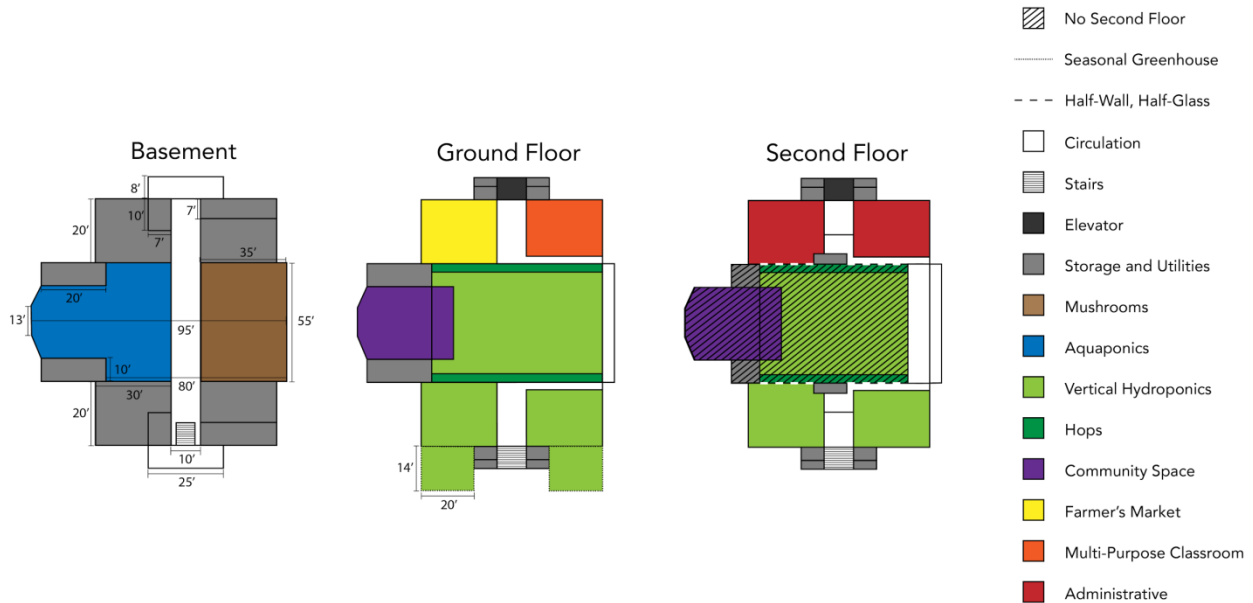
Floor plan of the school building repurposed as a greenhouse and indoor farm.
